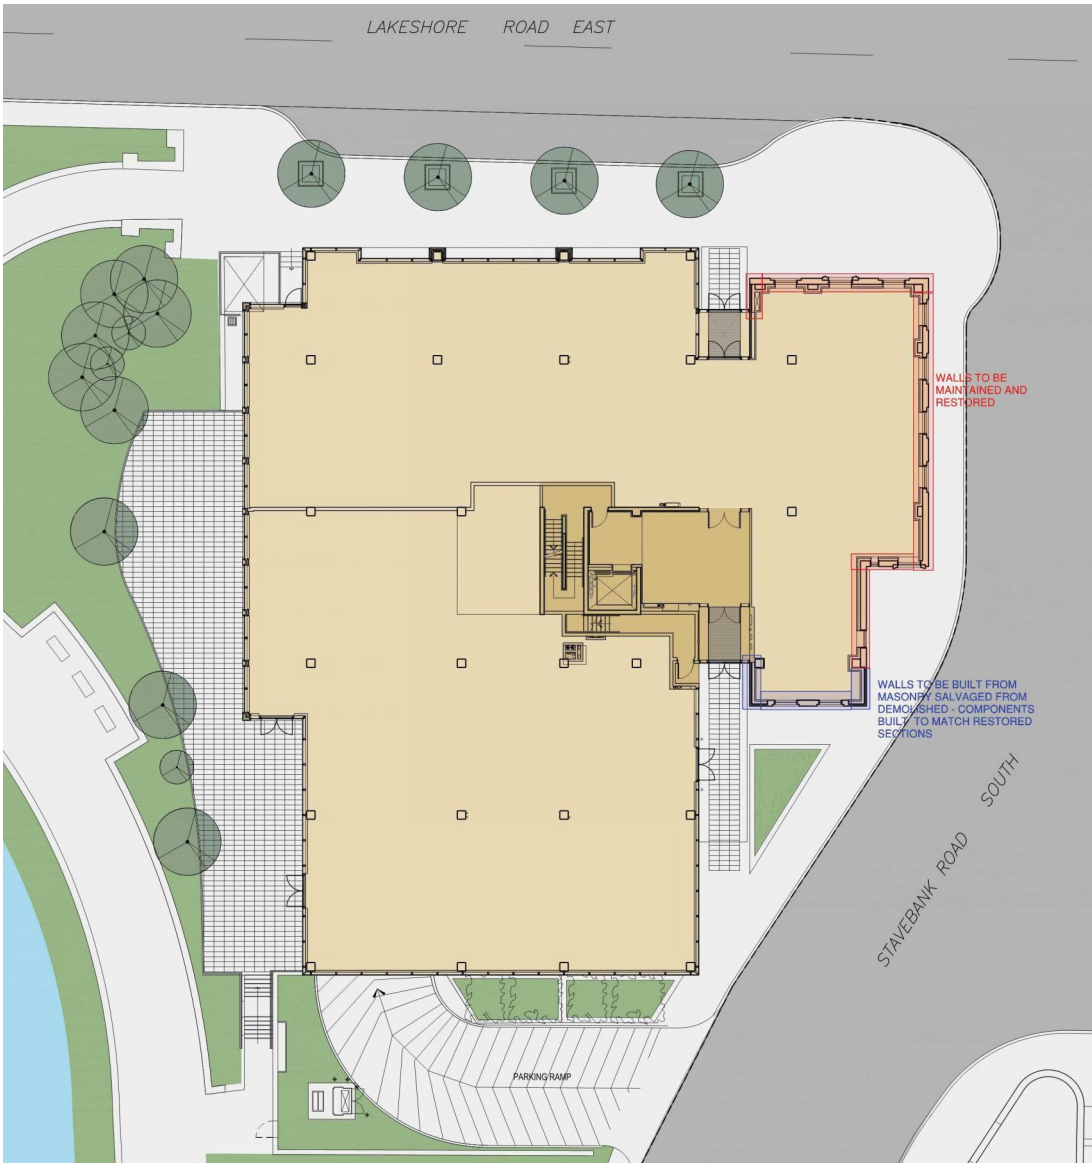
Ground Floor Plans showing preserved and rebuilt walls
